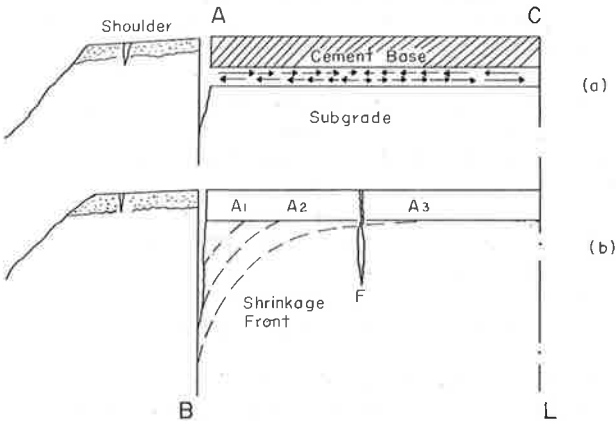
Proposed cracking mechanism: (a) Shear stress at base-subgrade interface; (b) crack developed in the subgrade, subsequently reflected through base.
